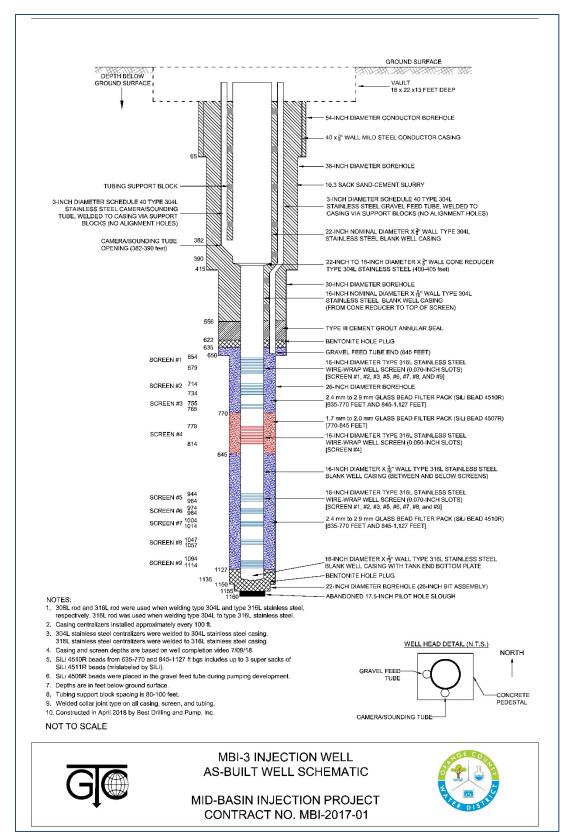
Injection Well MBI-3 As-Built Construction Diagram
